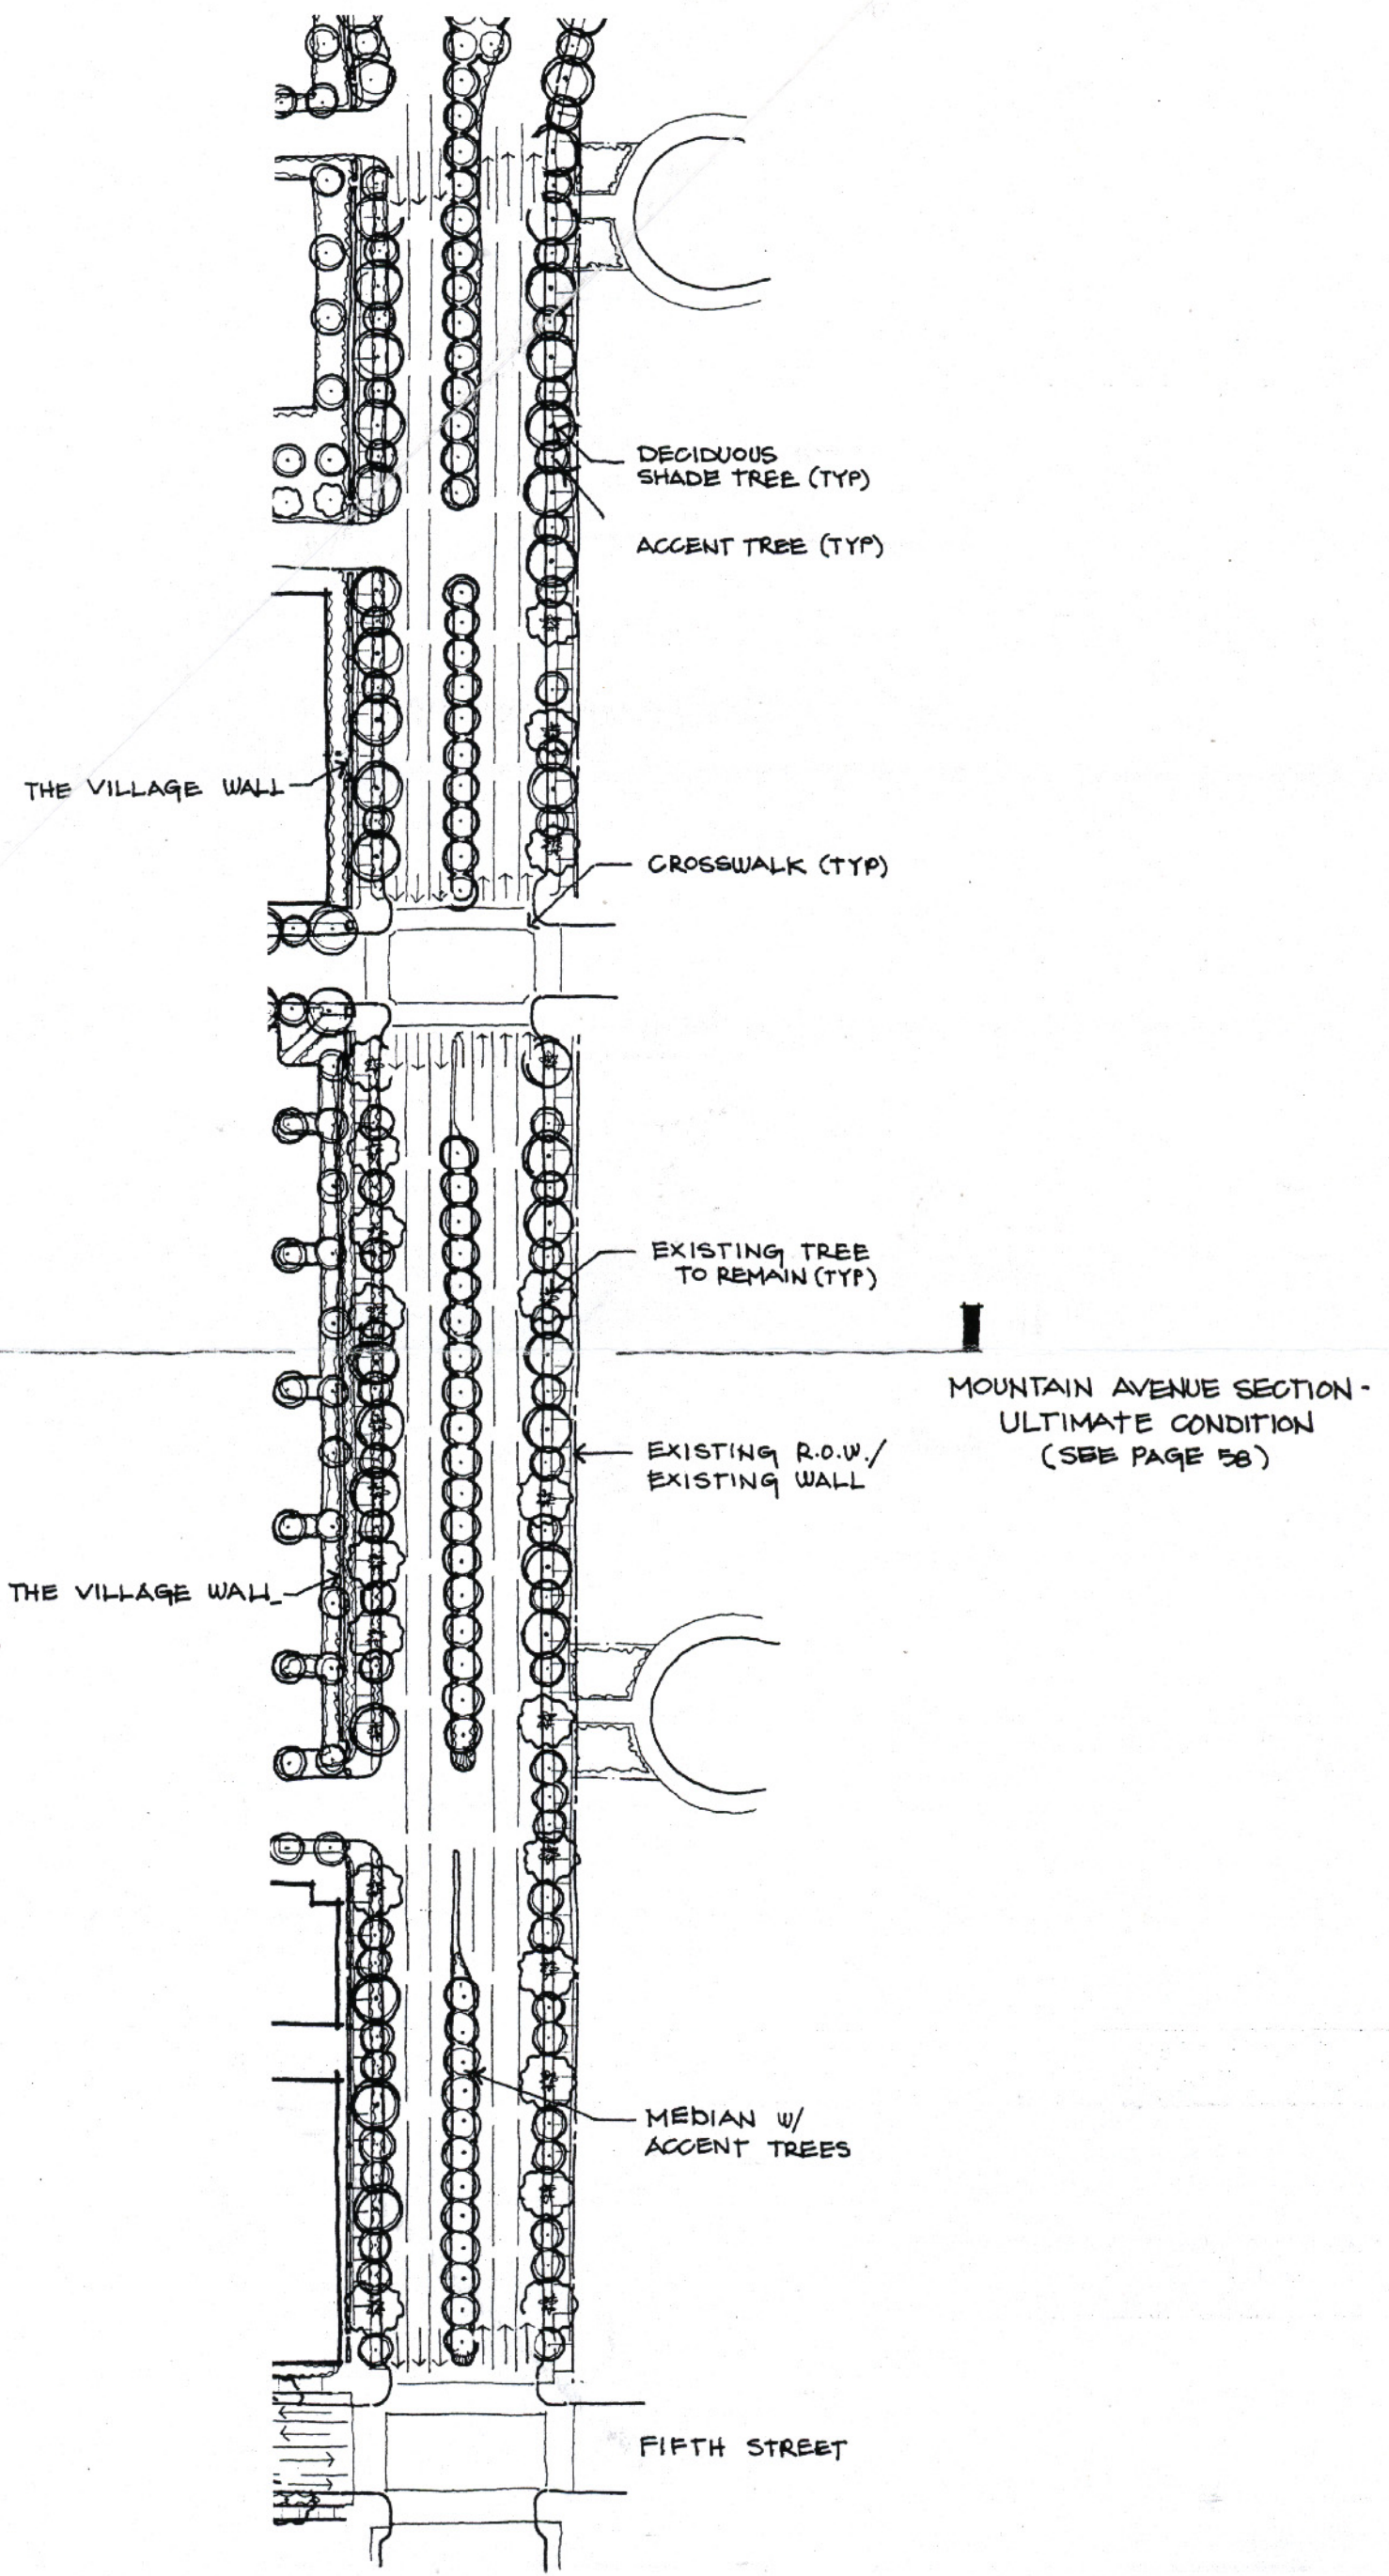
, Mountain Avenue south of Sixth Street Illustrative Plan.
